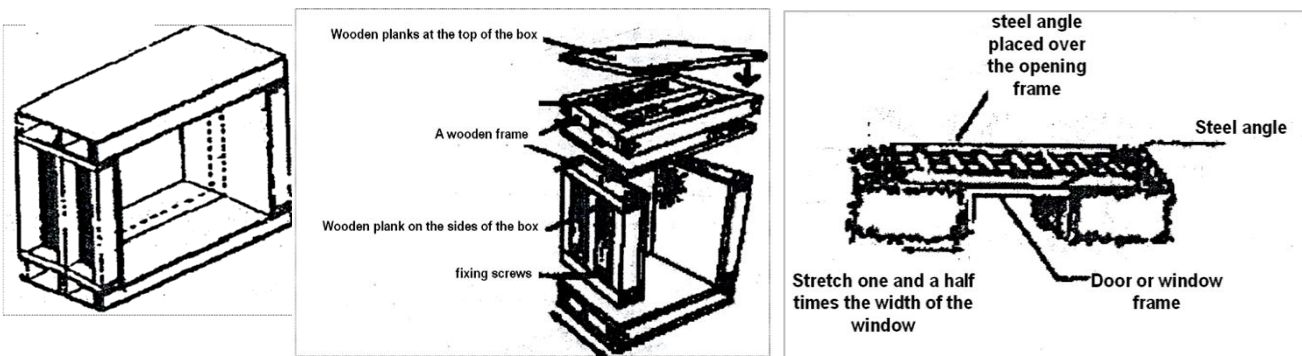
& Fig. 24: Structural box frames for doors and windows Fig. 25: Steel angle above the openings frame, the length of which is at least twice the width of the opening (Source: [16]).
